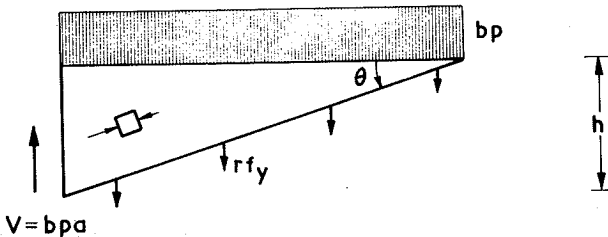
End zone of beam with vertical stirrups, bounded by section parallel to concrete compression
